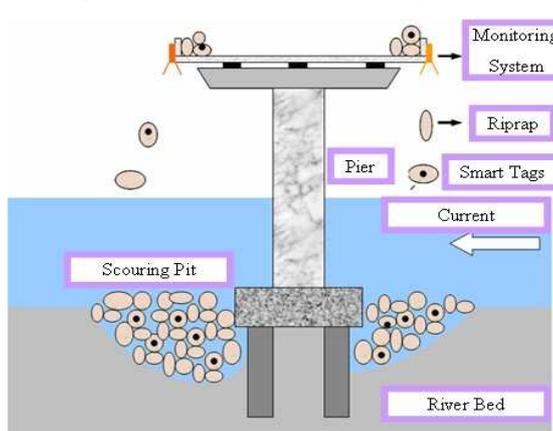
Scouring monitoring of bridge pier Fig 4. Monitoring for foundation stone's loss
